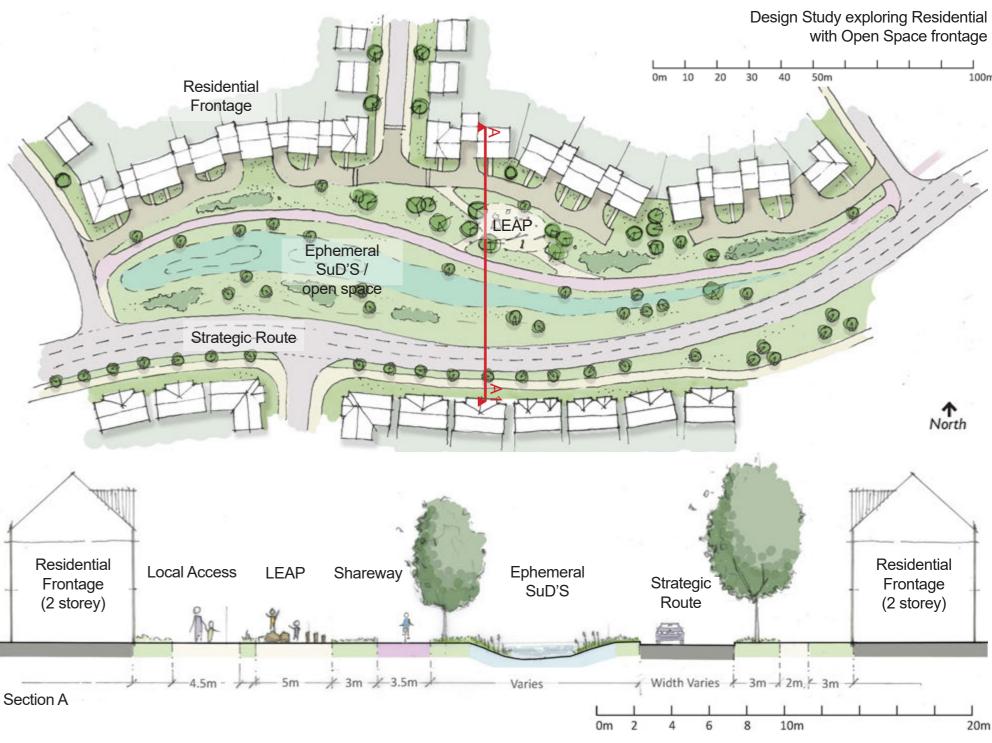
Strategic Route Design Study Location 1 - Plan and Section
